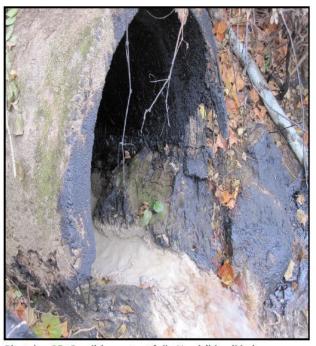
Begin excavation of the next 2 sections of storm water piping. Less oil observed seeping into groundwater. 11/7/18 (START photo IMG_1934.jpg)
